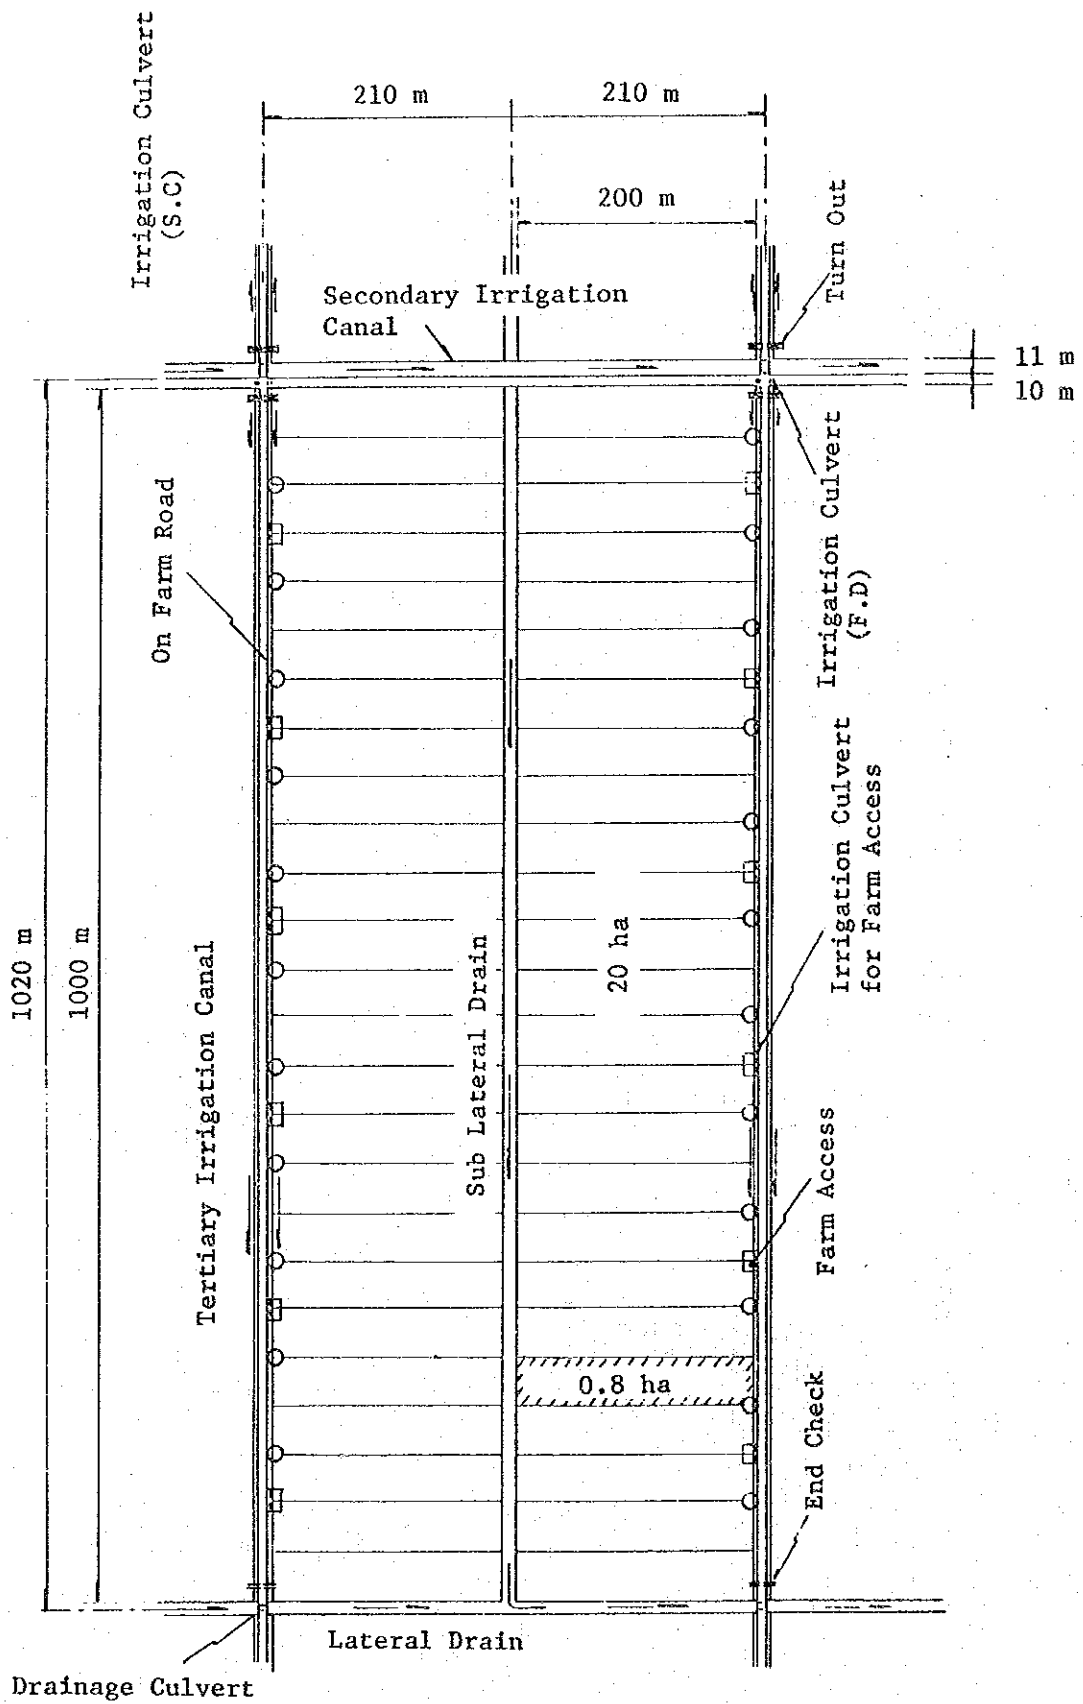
(1). GENERAL PLAN OF DEVELOPMENT AREA
